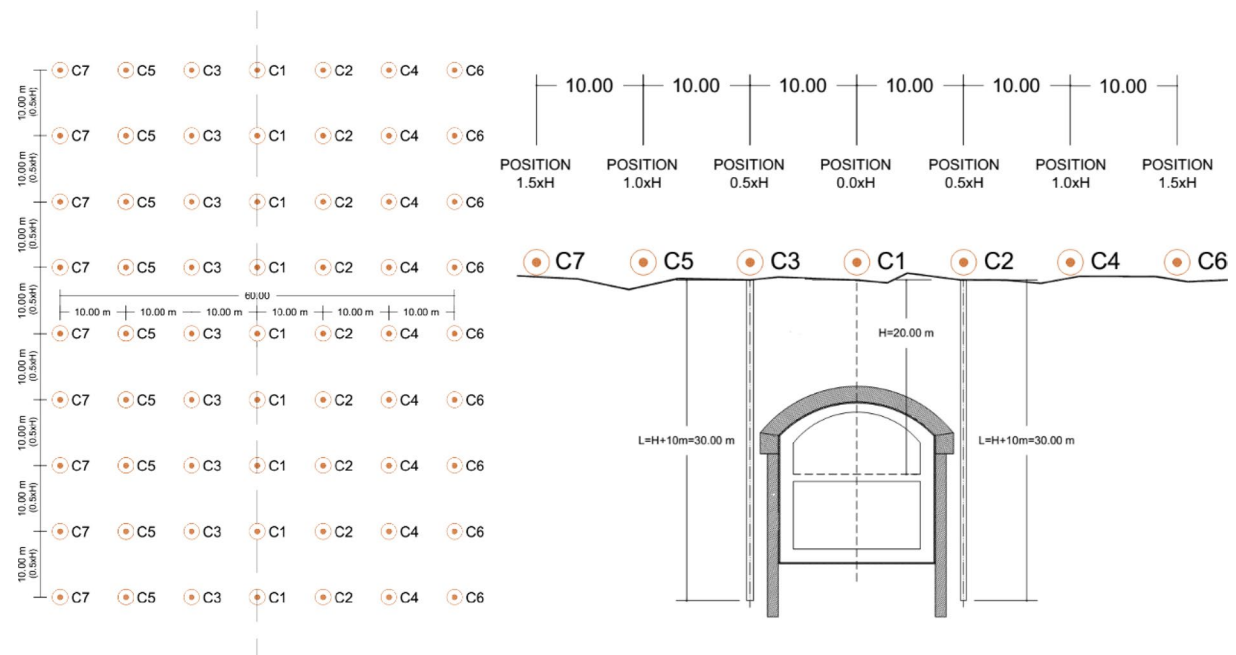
Layout of benchmarks in plan (left figure) and in cross section (right figure)
